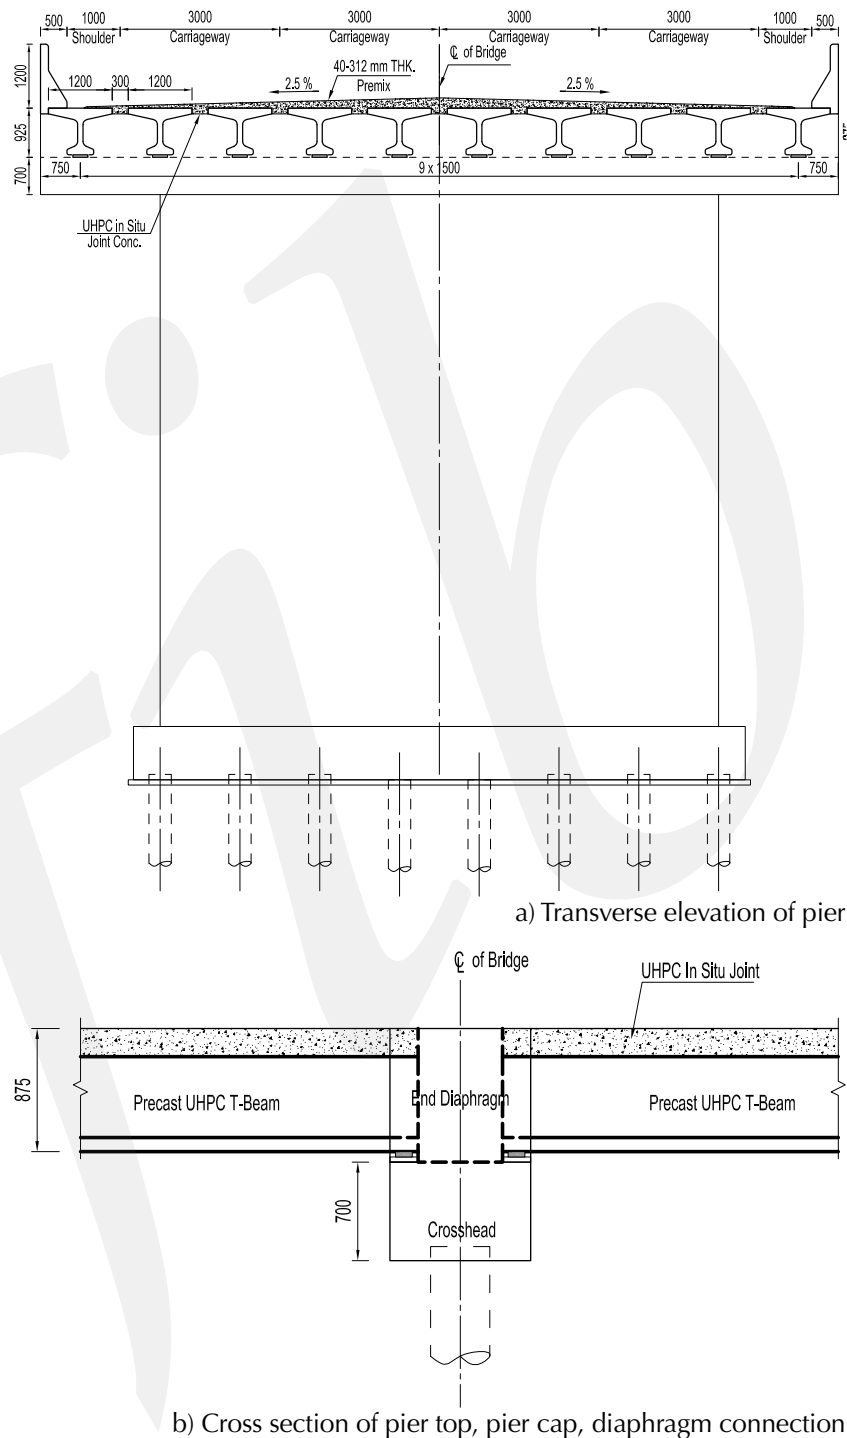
Transverse elevation of pier and cross section of pier top, pier cap, diaphragm connection.
